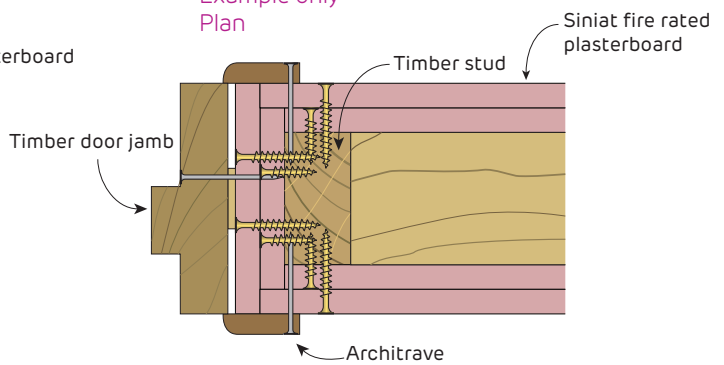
Typical Fire Rated Door Jamb Example only Plan
